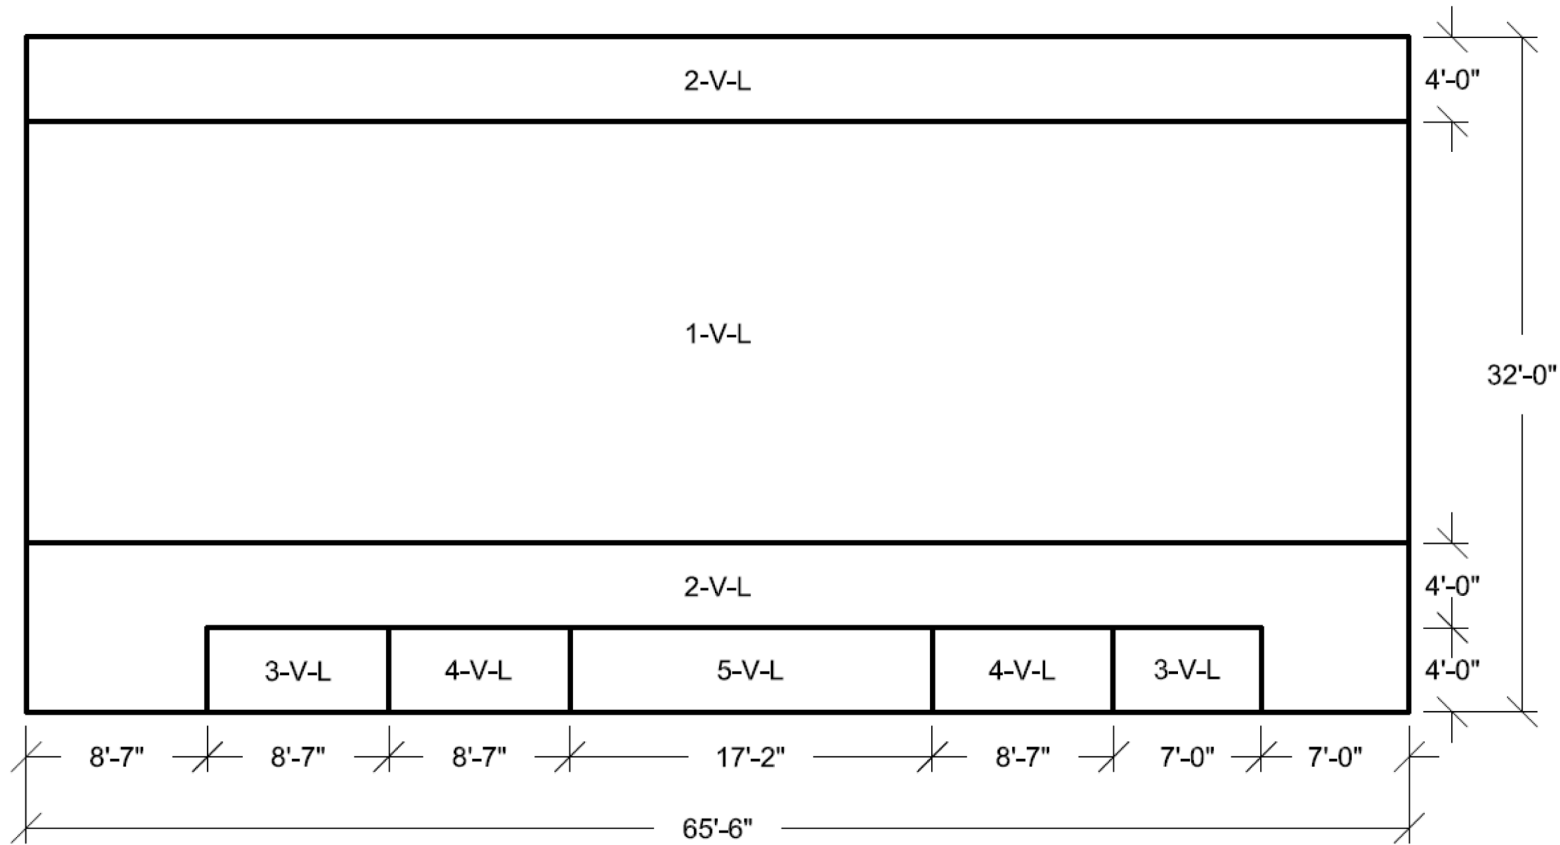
H.6-164 DGFOSV Wall 7 Looking From Outside
